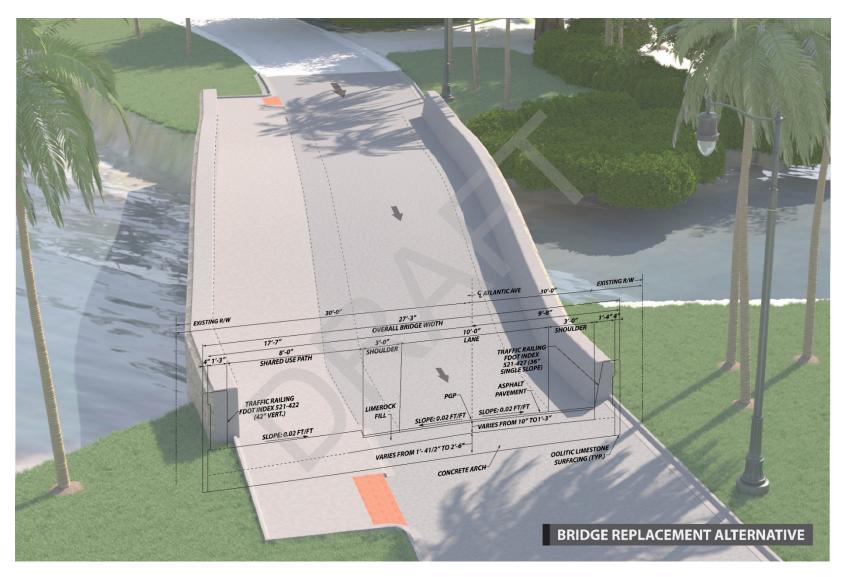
Bridge Replacement Alternative Typical Section (Facing Northwest)
